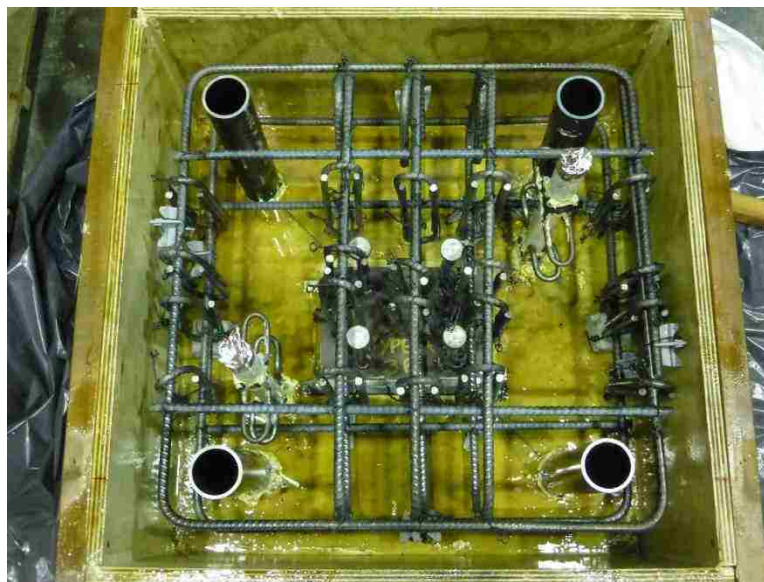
Reinforcement cage and steel pipes in place
